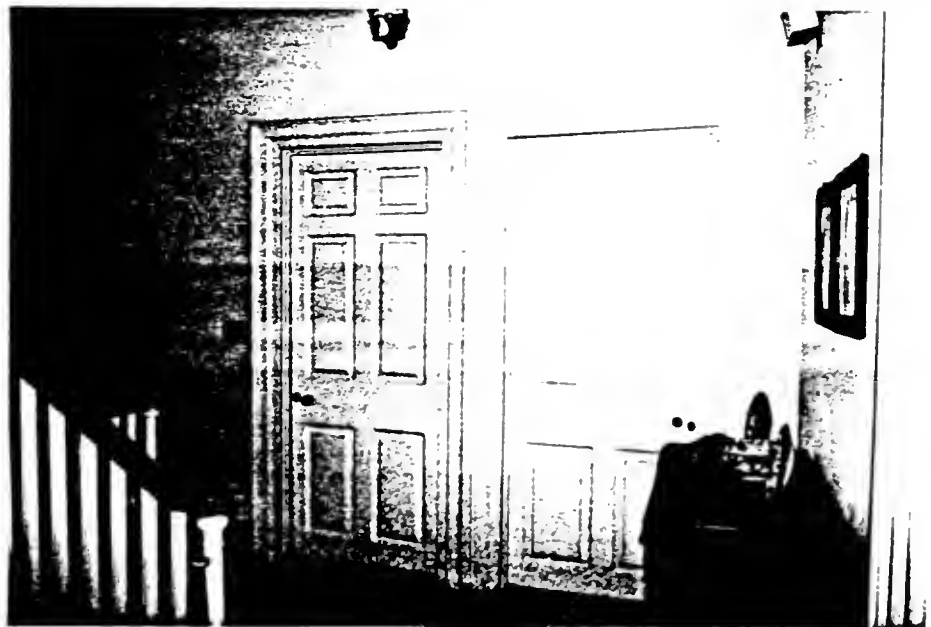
Second floor hall, looking east, all trim c. 1801.
